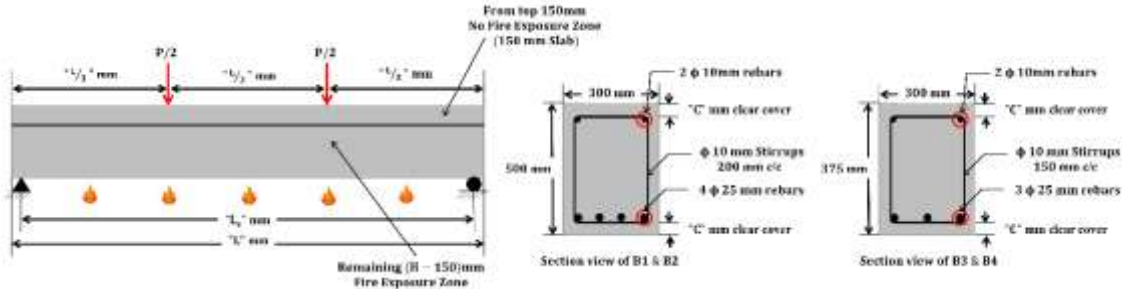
Beam sectional profile detail of typical RC beams selected for parametric study
